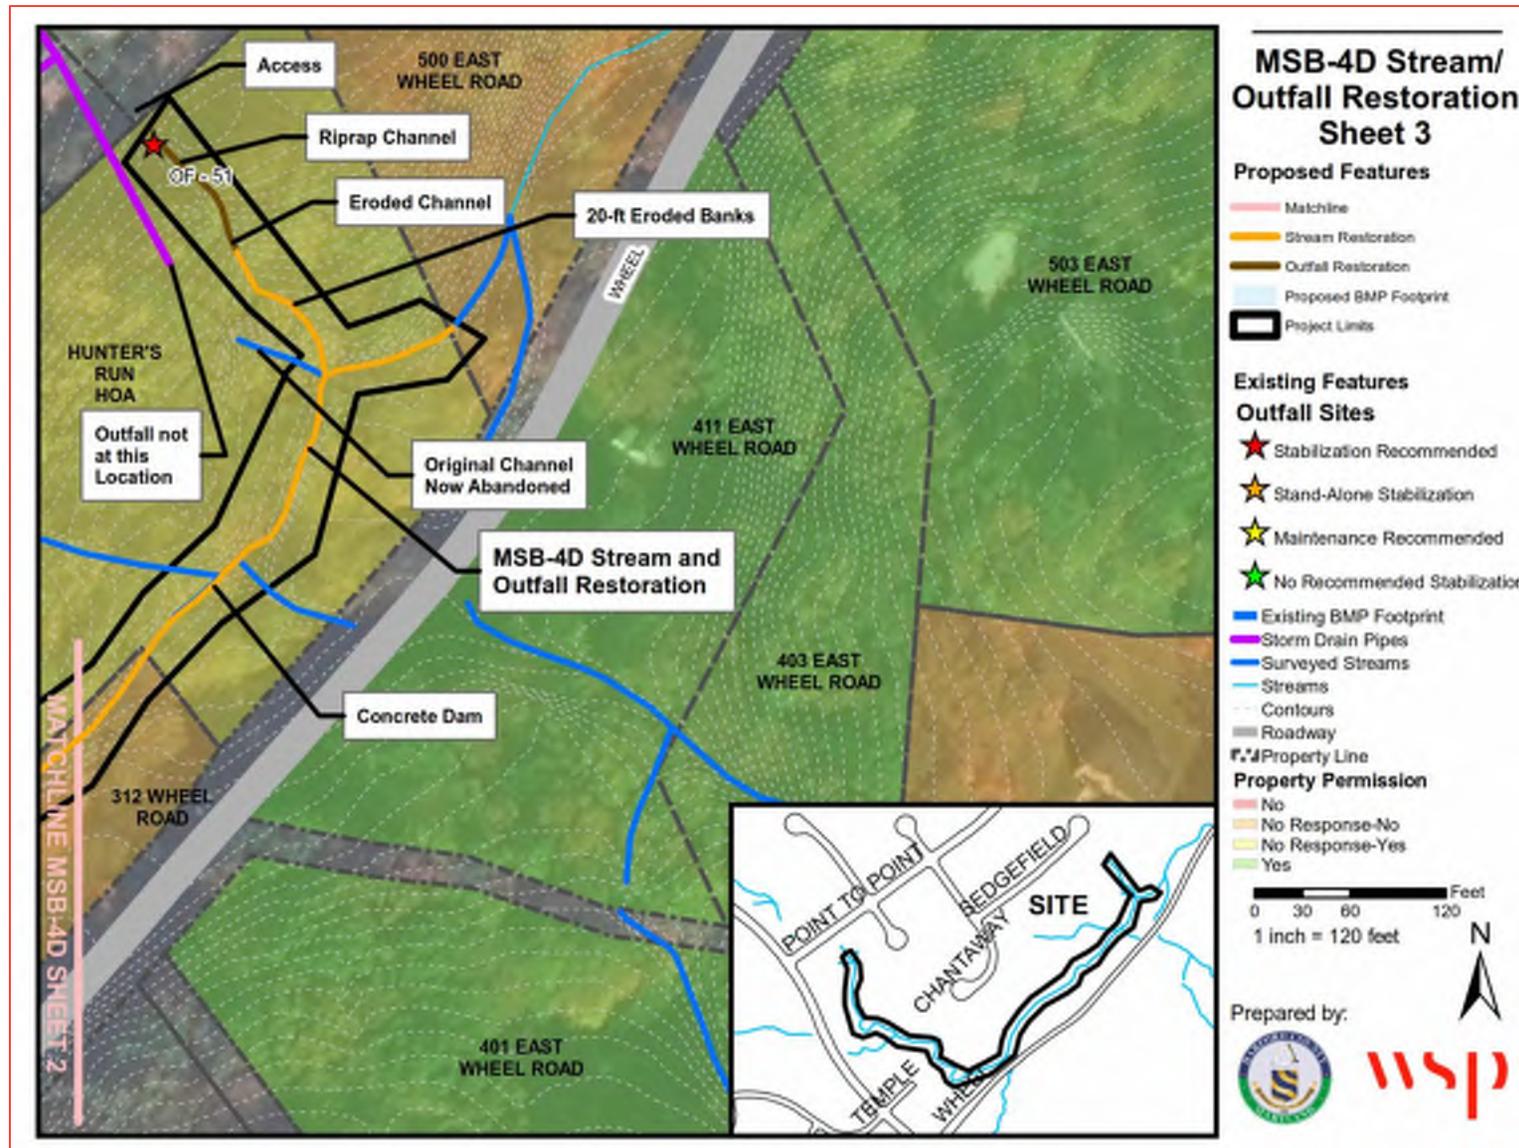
Site Location and Proposed Project Plan for MSB-4D Stream and Outfall Restoration (Sheet 3 of 3)
